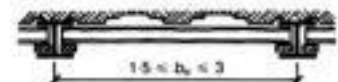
'Heidelberg' soldier pile and lagging wall allowing extraction of steelwork wallings and soldiers (patented by Bilfinger and Berger)
